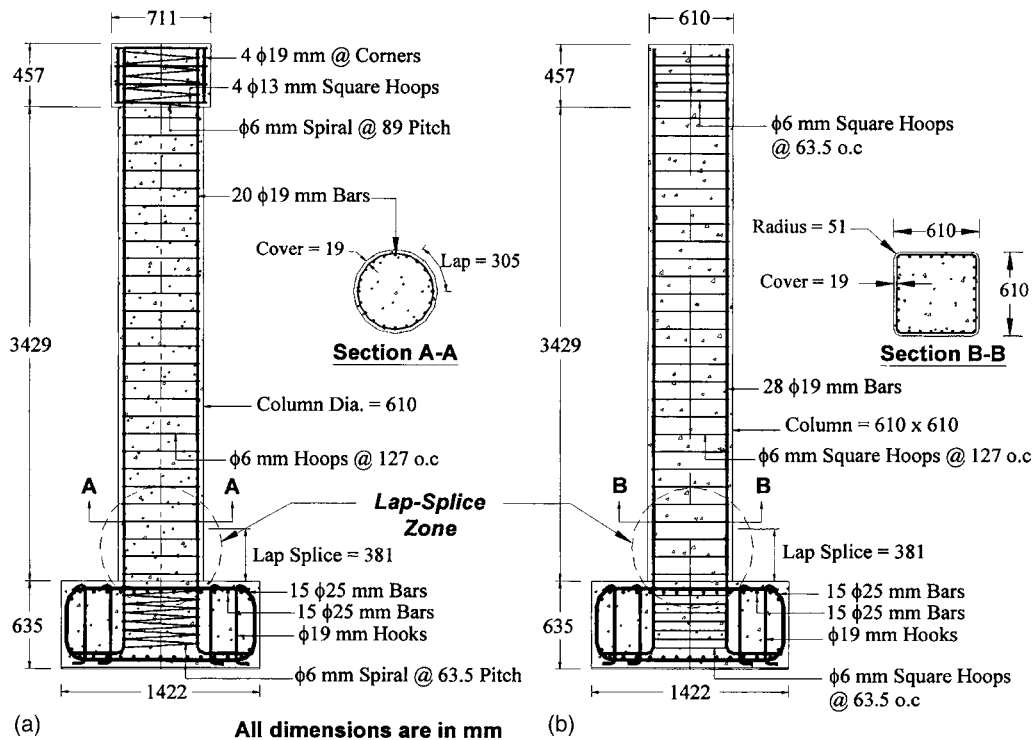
Reinforcement details for lap-splice column samples: (a) circular columns and (b) square columns
